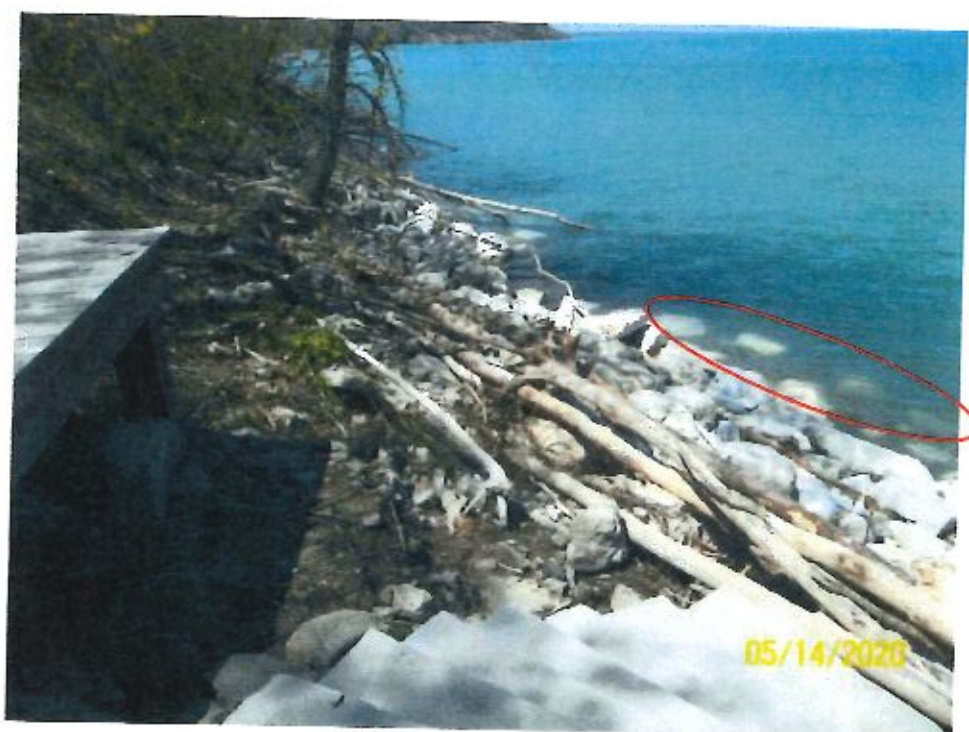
LOOKING NORTH ALONG THE SUBJECT SHORELINE AT THE EXISTING CONCRETE RUBBLE AND RIP RAP REVETMENT. THE STONES CIRCLED IN RED SHOULD BE SALVAGED AND MOVED WESTWARD.
